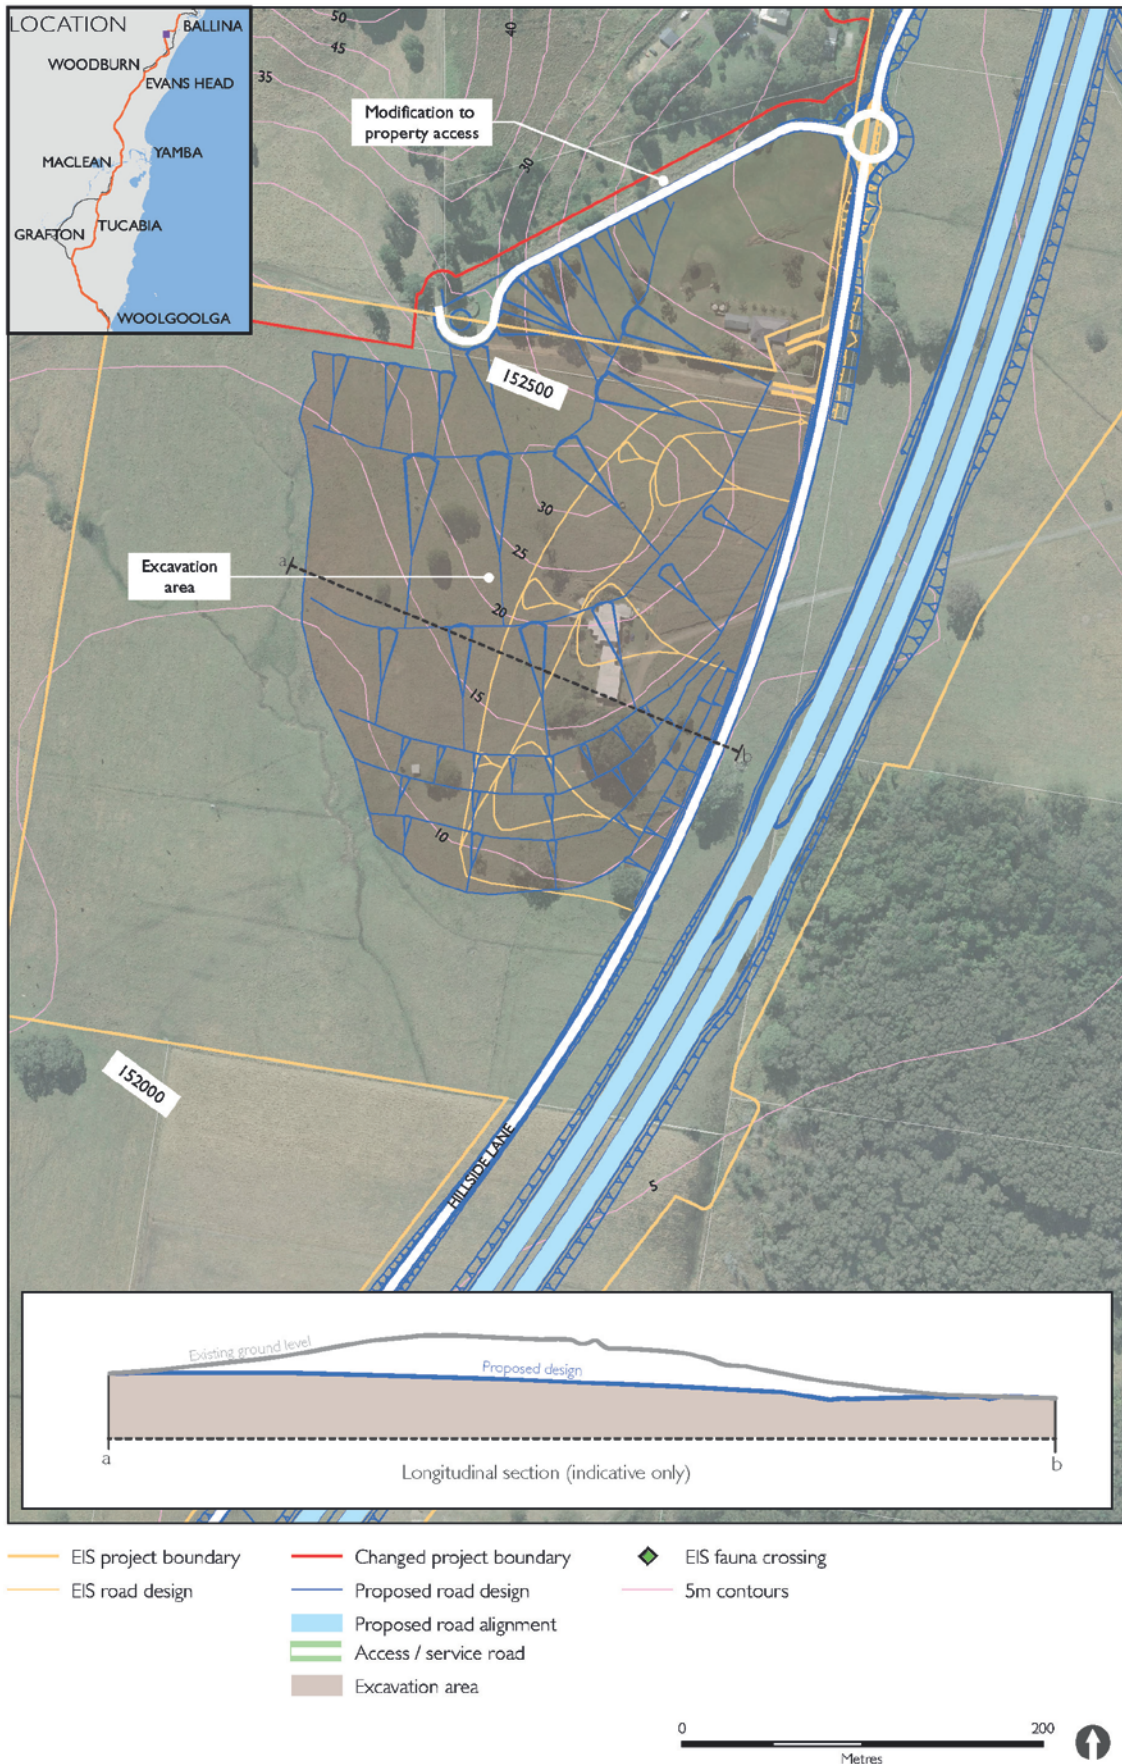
Revised excavation design at the borrow source west of Wardell
